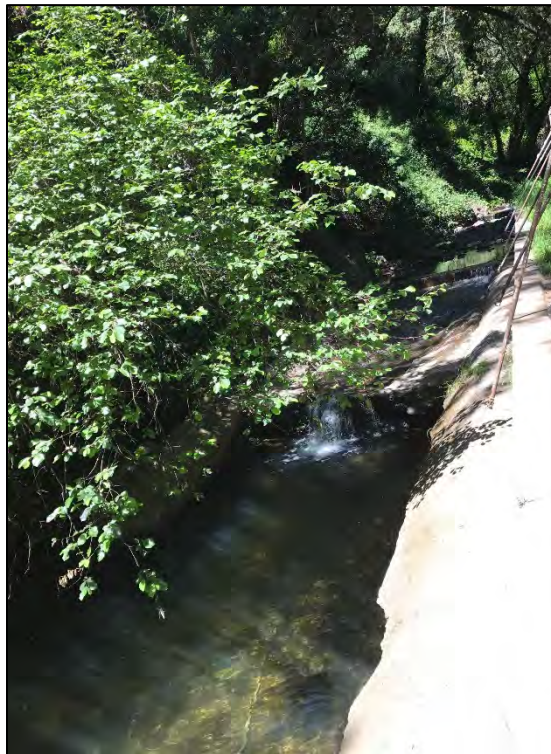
Underneath Leimert Boulevard Bridge, Facing Northeast, Upstream of Sausal Creek (May 2017)
